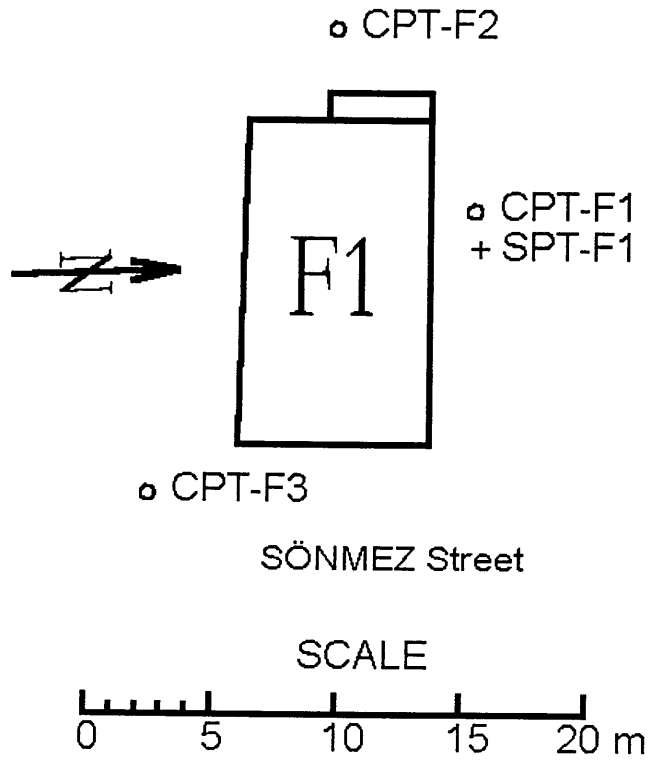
Plan view of Site F and location of subsurface exploration points
